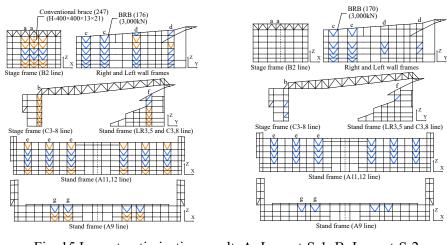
Layout optimization result, A: Layout-S-1, B: Layout-S-2
